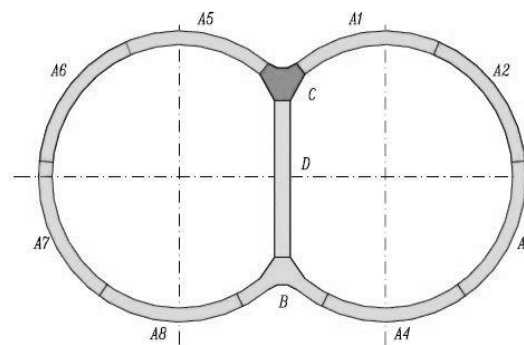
Section of the lining in Shanghai DOT tunnel (Chow, 2006)
